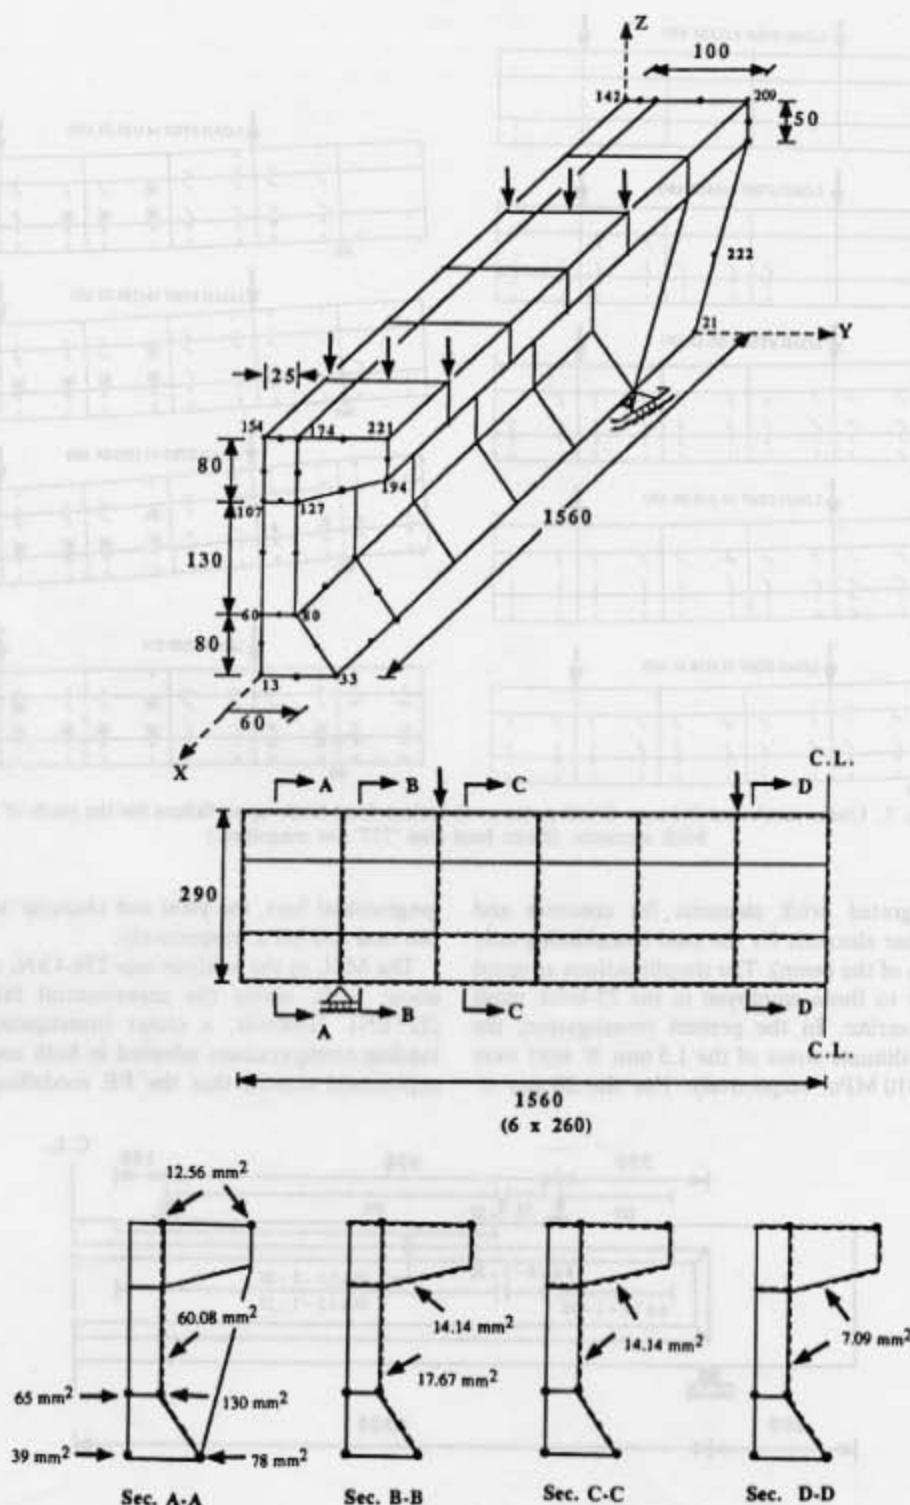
Beam HSB1. Mesh of 25 brick elements. (Due to symmetry only one-fourth of the beam is analysed. The position of the steel elements is indicated by dashes.)
